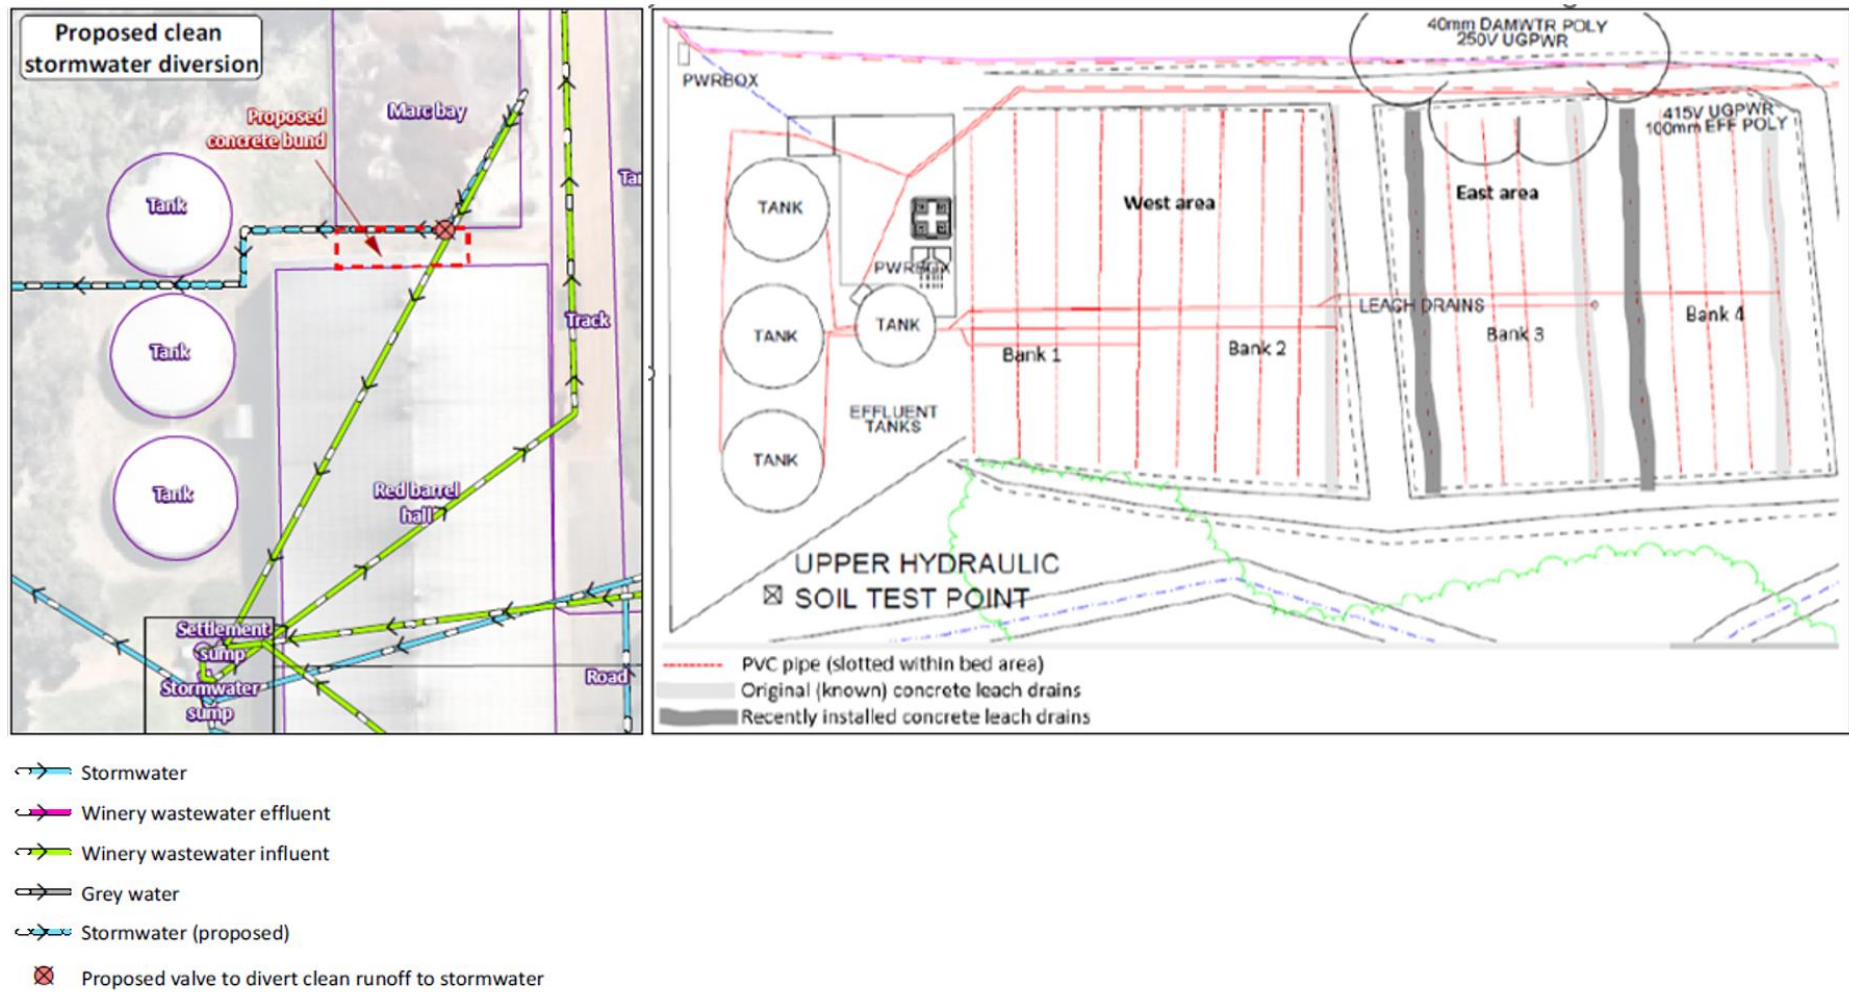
Leach drain field layout and location of new sludge dewatering bund (proposed concrete bund)
